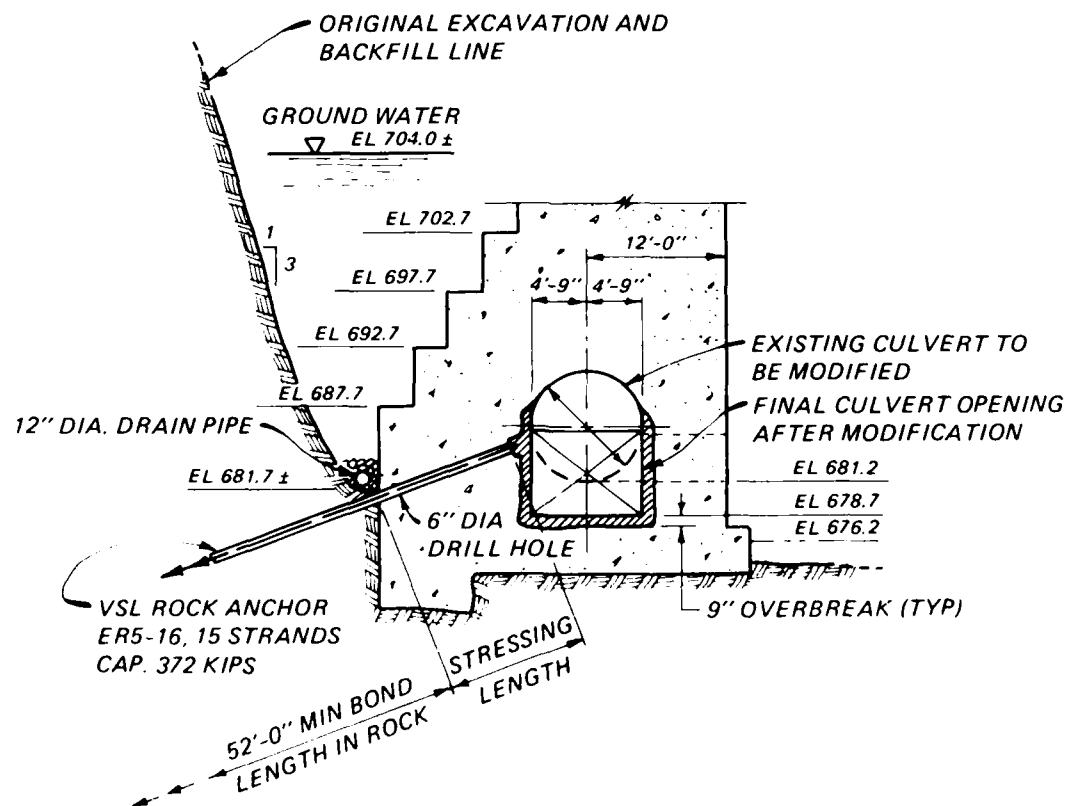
Typical section through landwall culvert, Lock No. 1, Mississippi River
